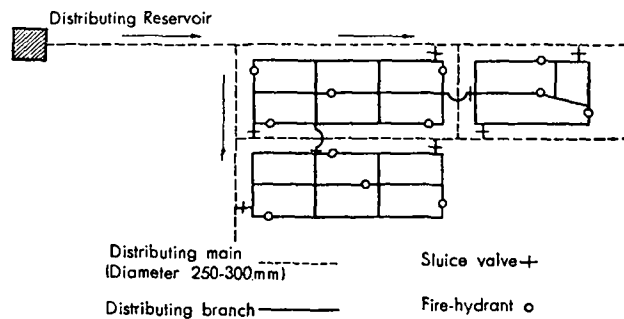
AN EXAMPLE OF BLOCK SYSTEM
